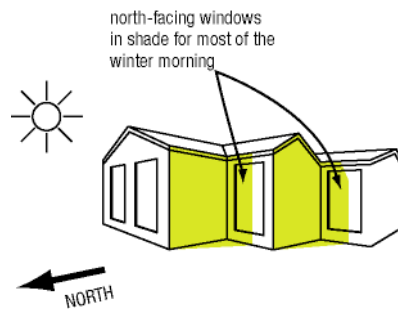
East and west-facing walls can shade adjacent north-facing windows in winter
